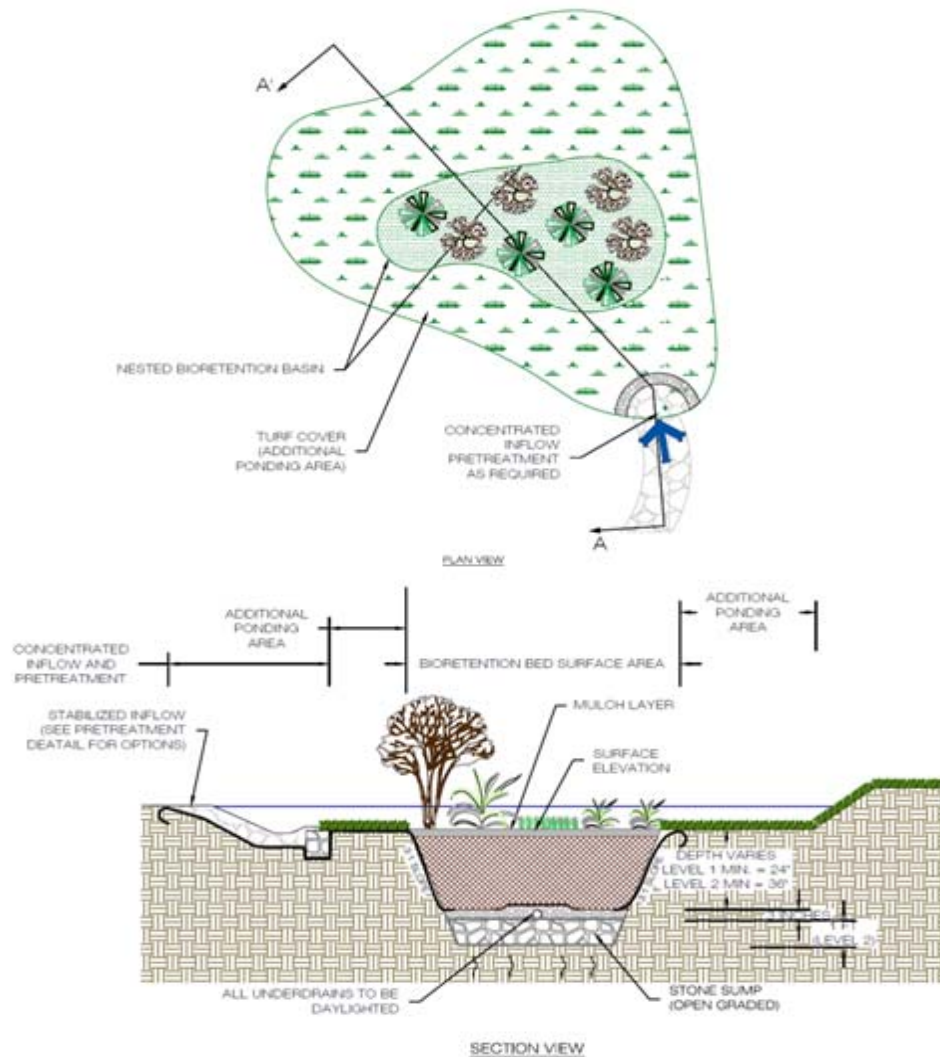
Typical section of bio retention pond (Adopted From: Virginia Storm water specs 2011)
